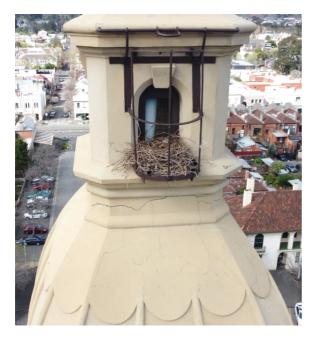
Crack at the top of the dome around the Figure 20: East Elevation perimeter of the Bell Tower. North Elevation
